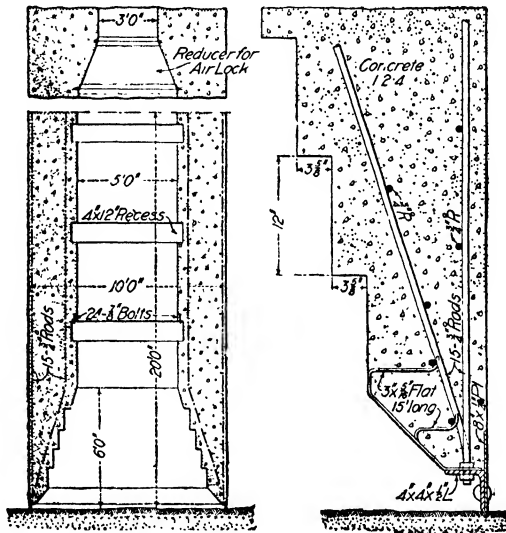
Pneumatic Caissons of Reinforced Concrete for Bronx Viaduct of New York Connecting Railway.
